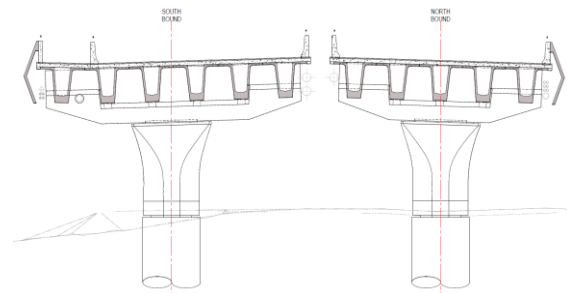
Typical Pier Cross section of Waikanae River Crossing
